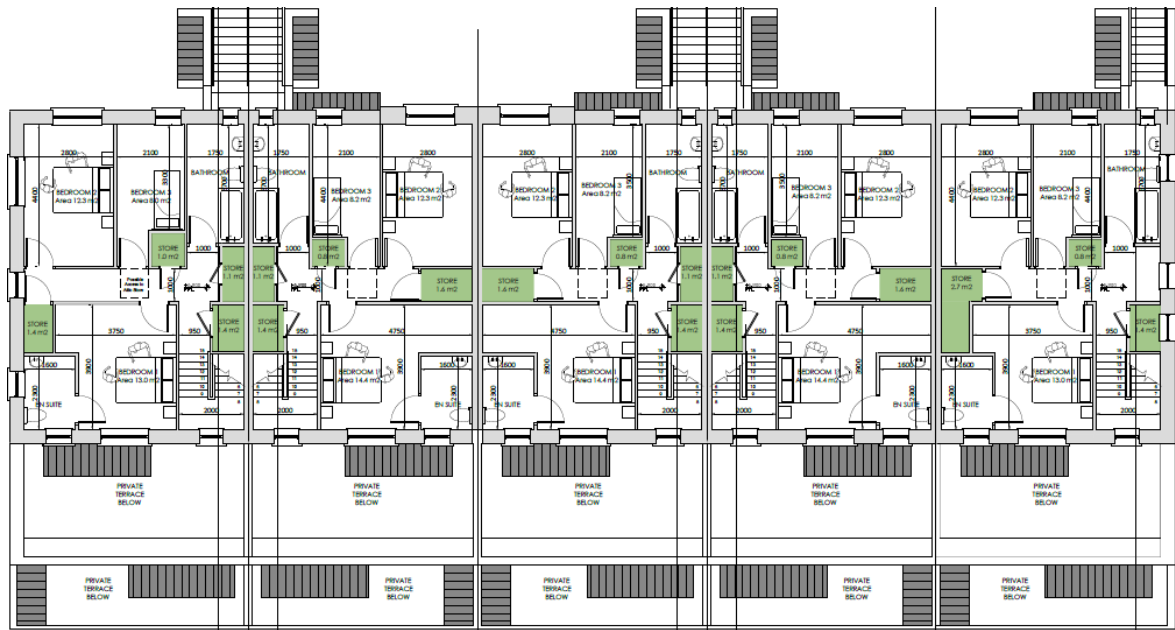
Proposed second floor plan of Duplex Apartment Block B.
